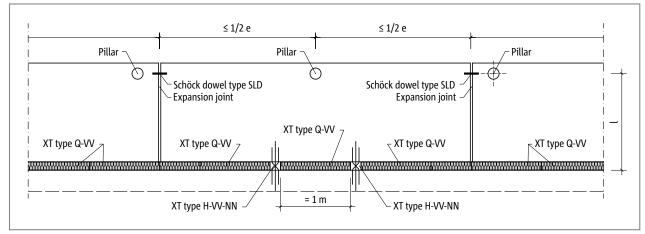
Schöck Isokorb® XT type H: Expansion joint arrangement
